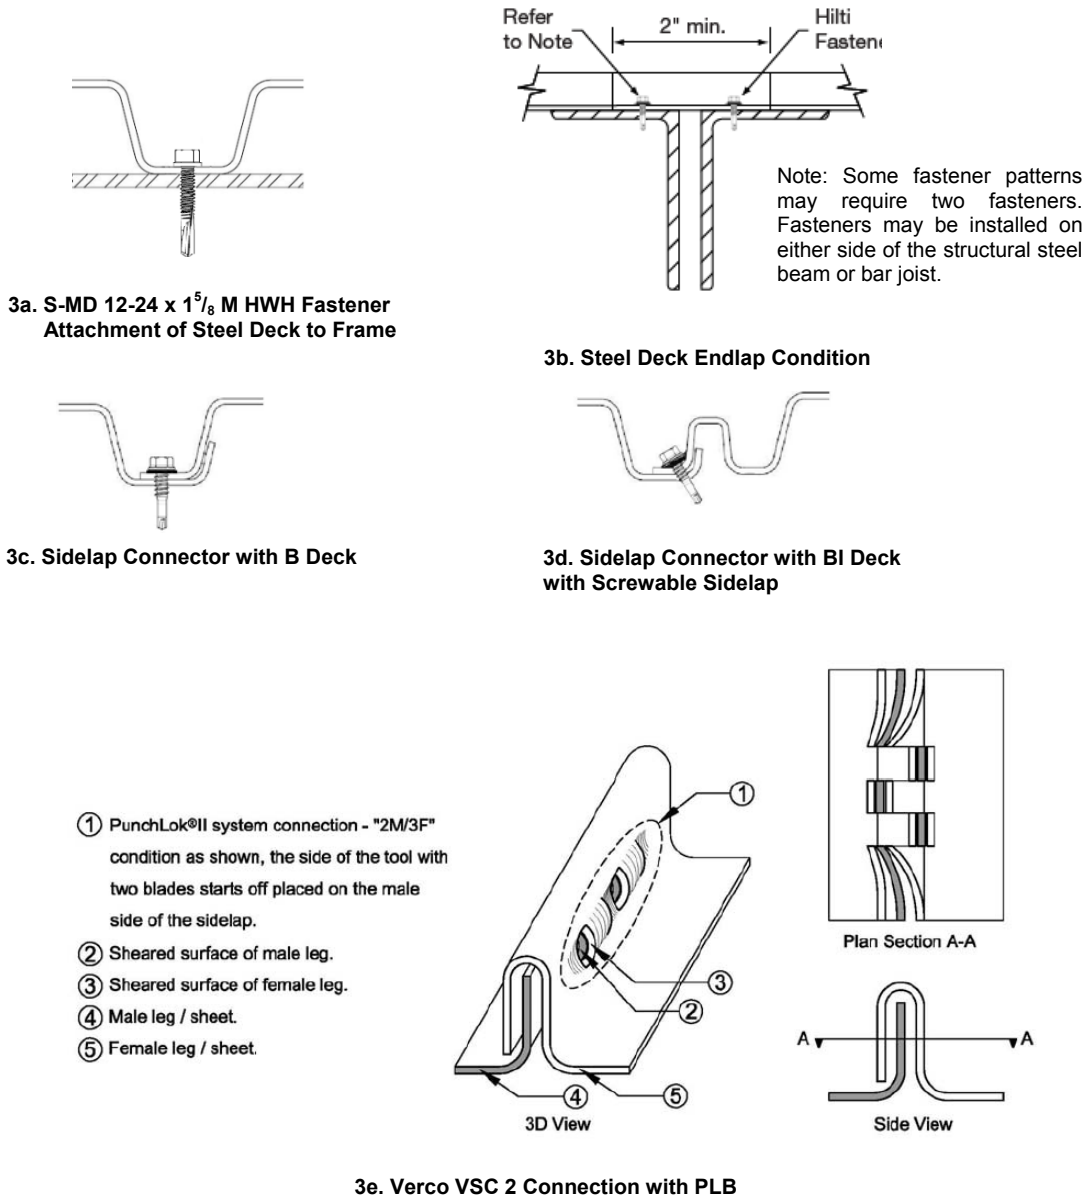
TYPICAL FRAME, ENDLAP AND SIDELAP CONNECTIONS
